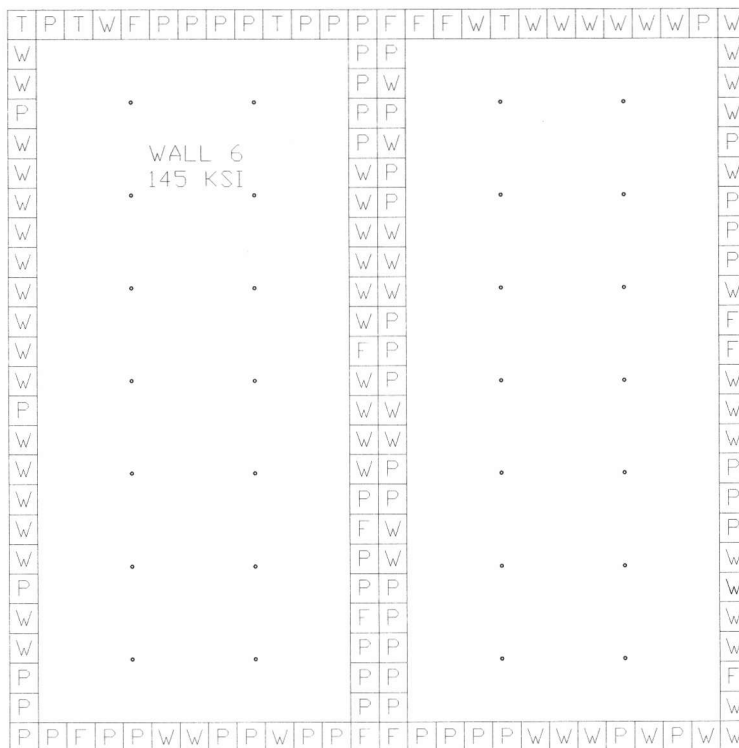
Sheathing nail failure modes for Wall 6, $f_{yb}=145$ ksi.
